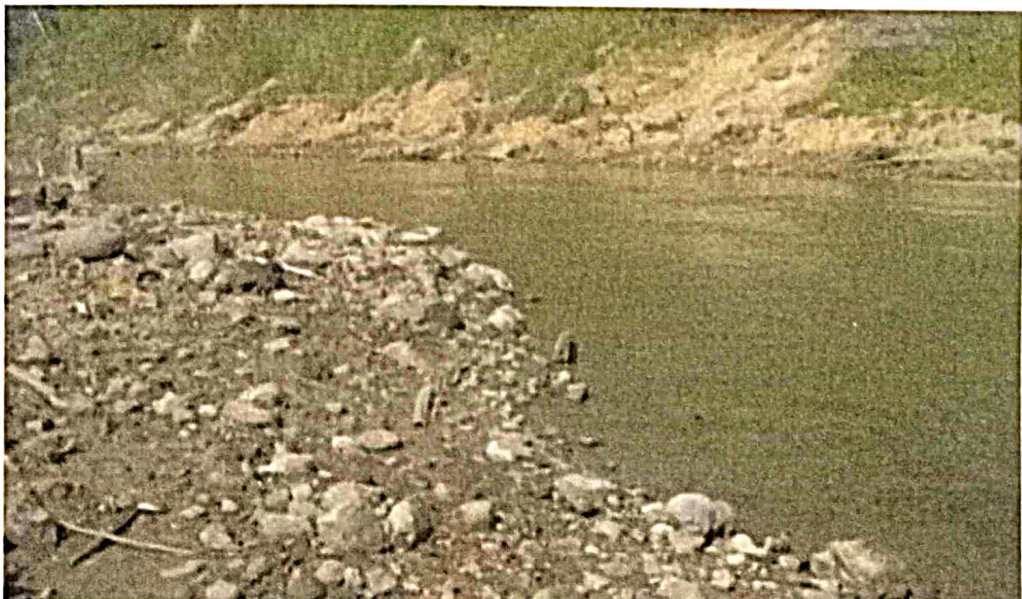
Site 4: Diversion outlet situated downstream of river.
